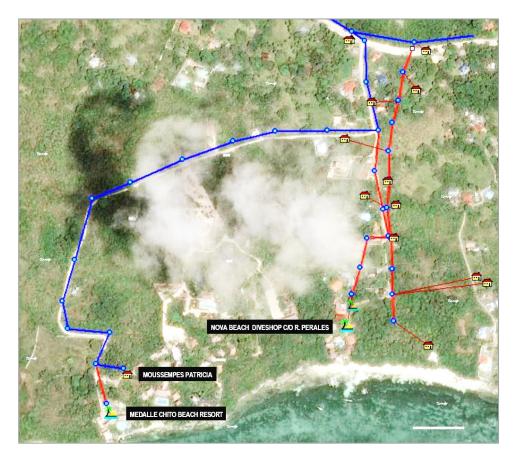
Where existing and new House connection are tapped to existing multipleuser initiated Line Construction.
